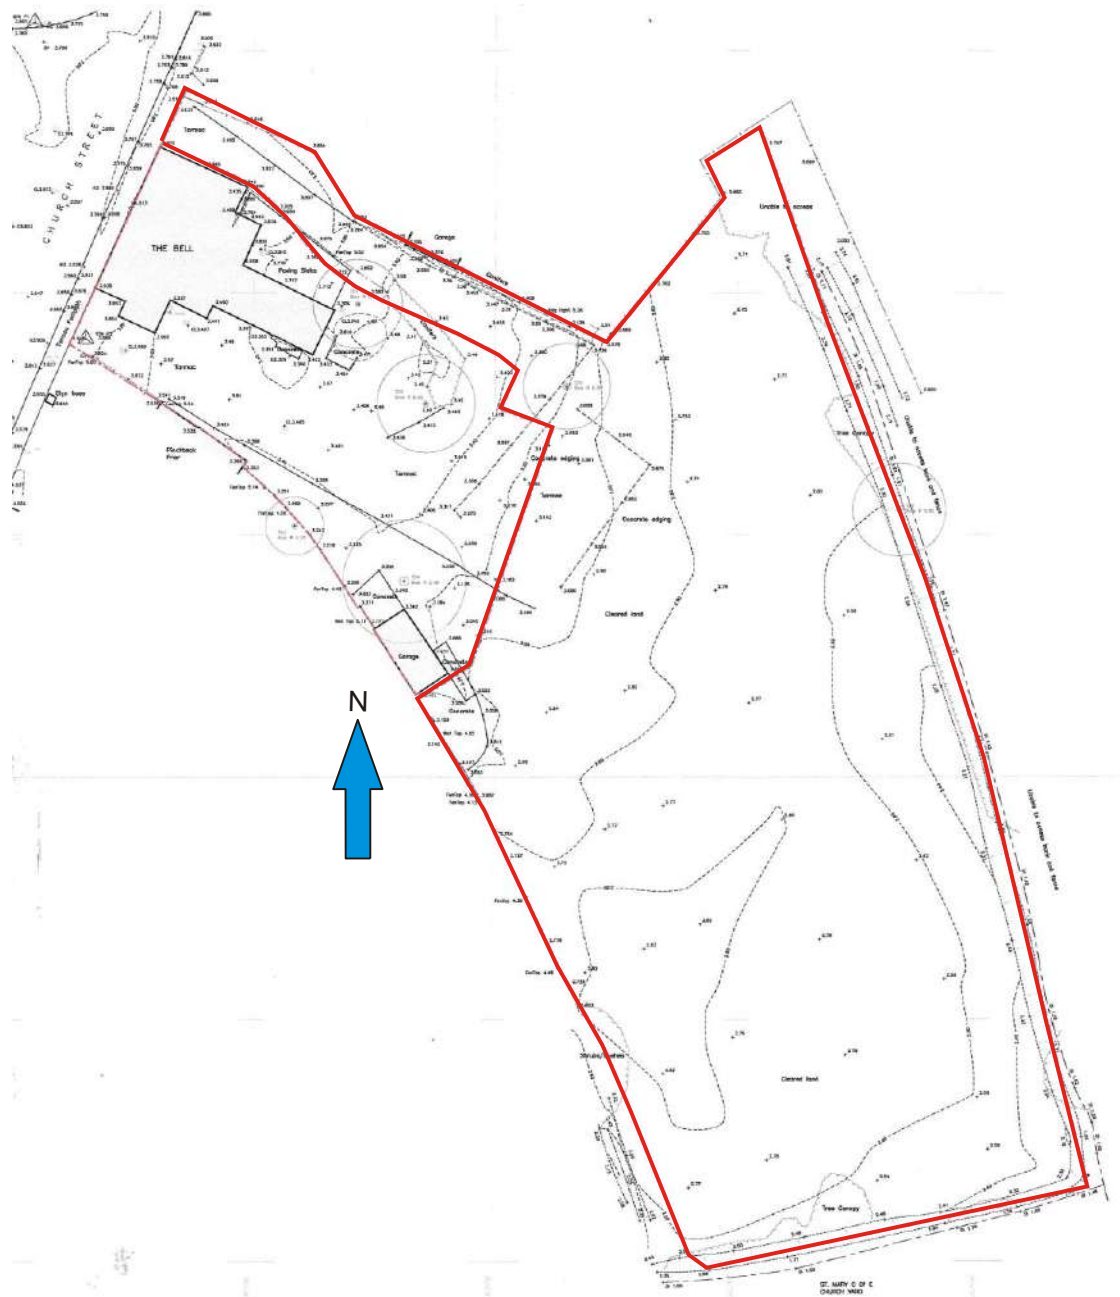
Plan showing the existing layout of the assessment site at an original scale of 1:200 at A1, (extract from Architects plan).
